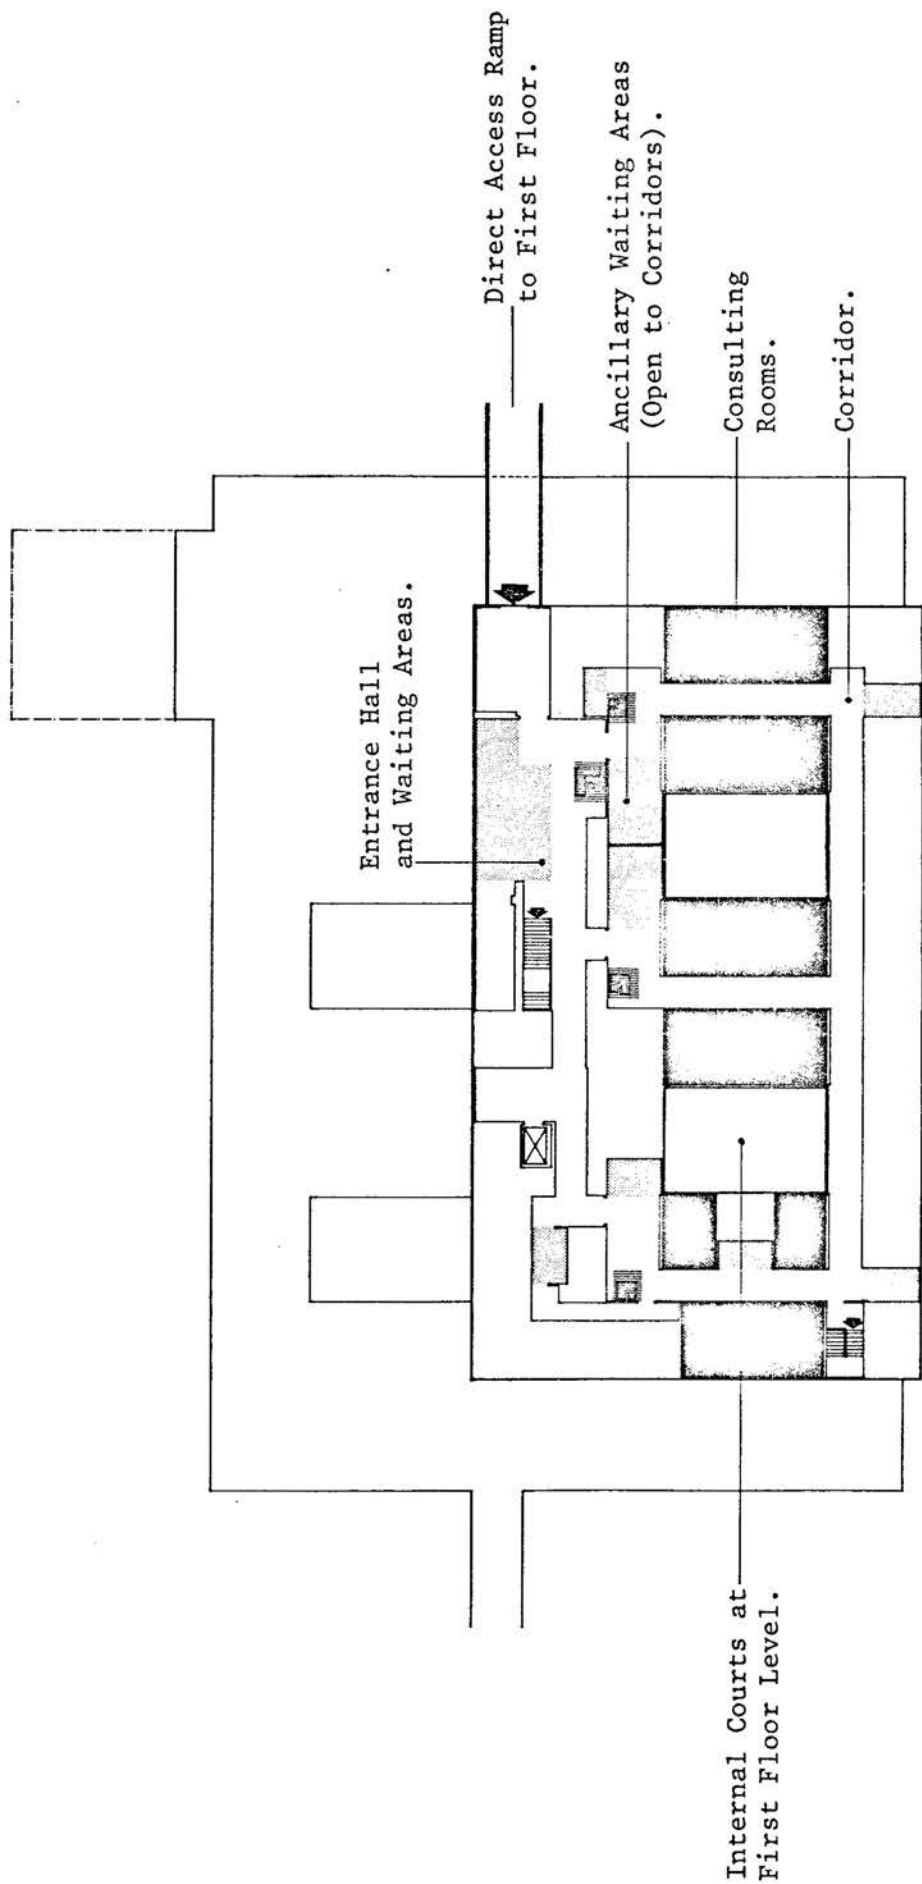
DUMBARTON HEALTH CENTRE (GROUND FLOOR ZONE PLAN).
